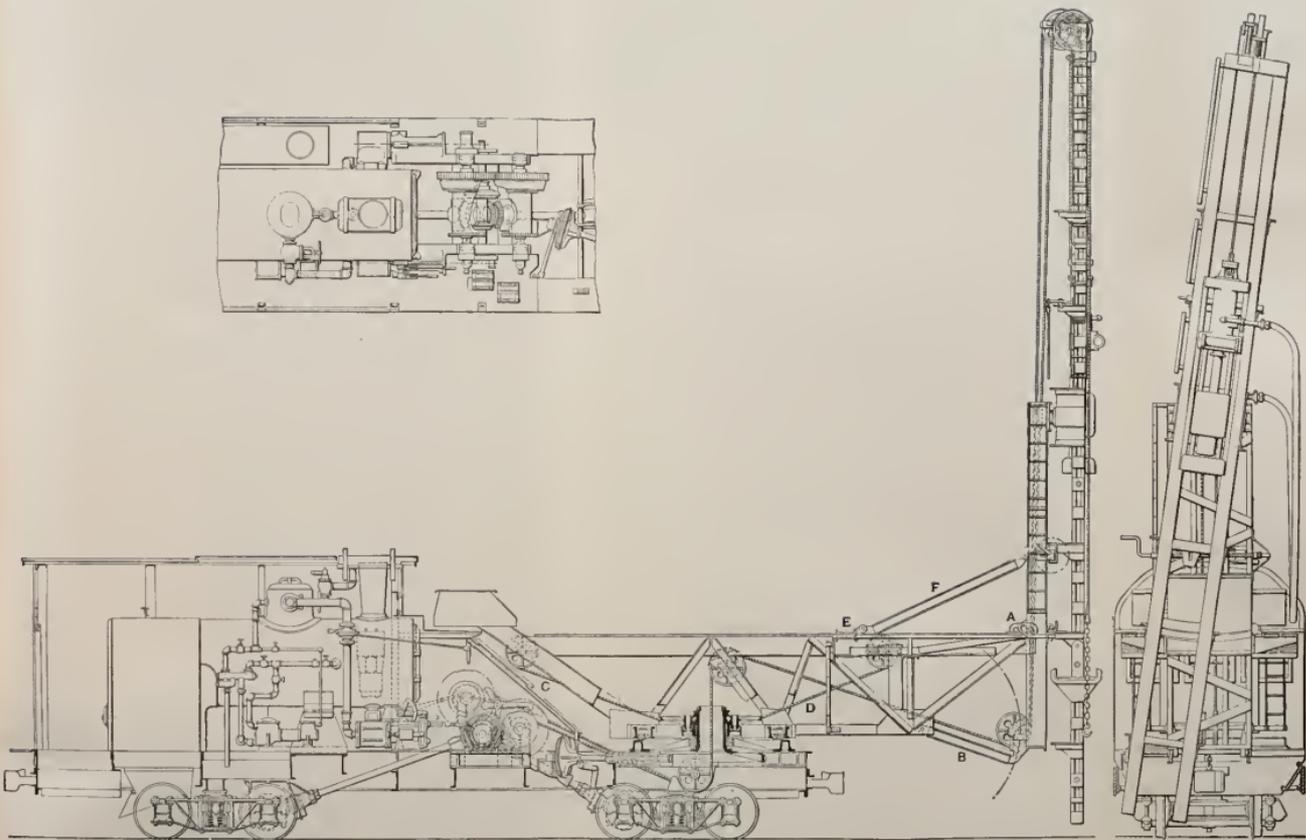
TRACK PILE-DRIVER—ATCHISON, TOPEKA & SANTA FE RAILWAY
